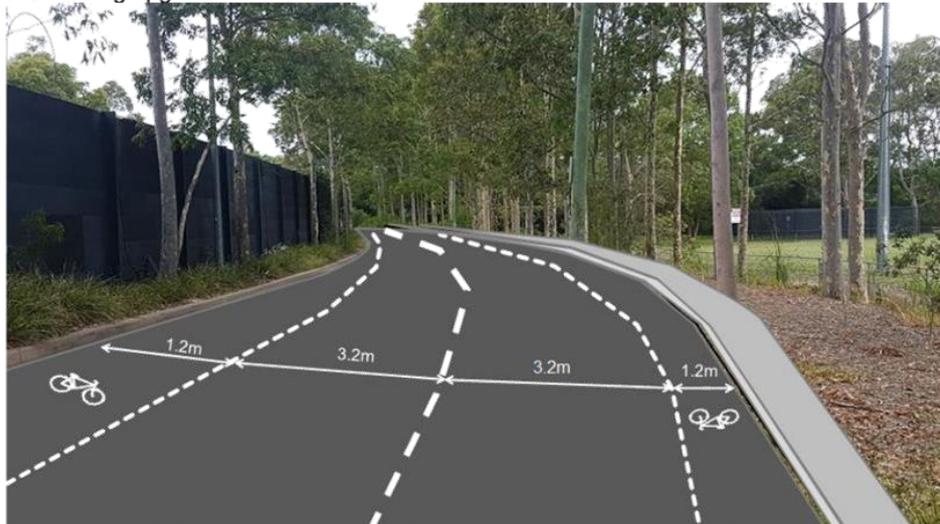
typical example of separated unidirectional cycleway in Canal Rd
